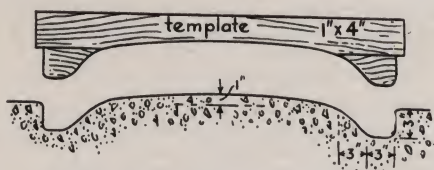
Type of Open Drain and Template for Forming the Gutter
